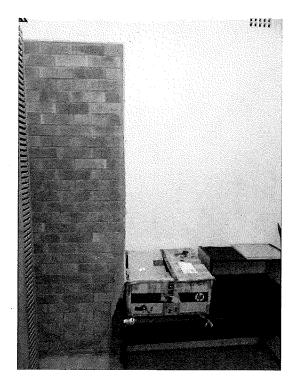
ACMA Facility Main Building interior bricked up access.
